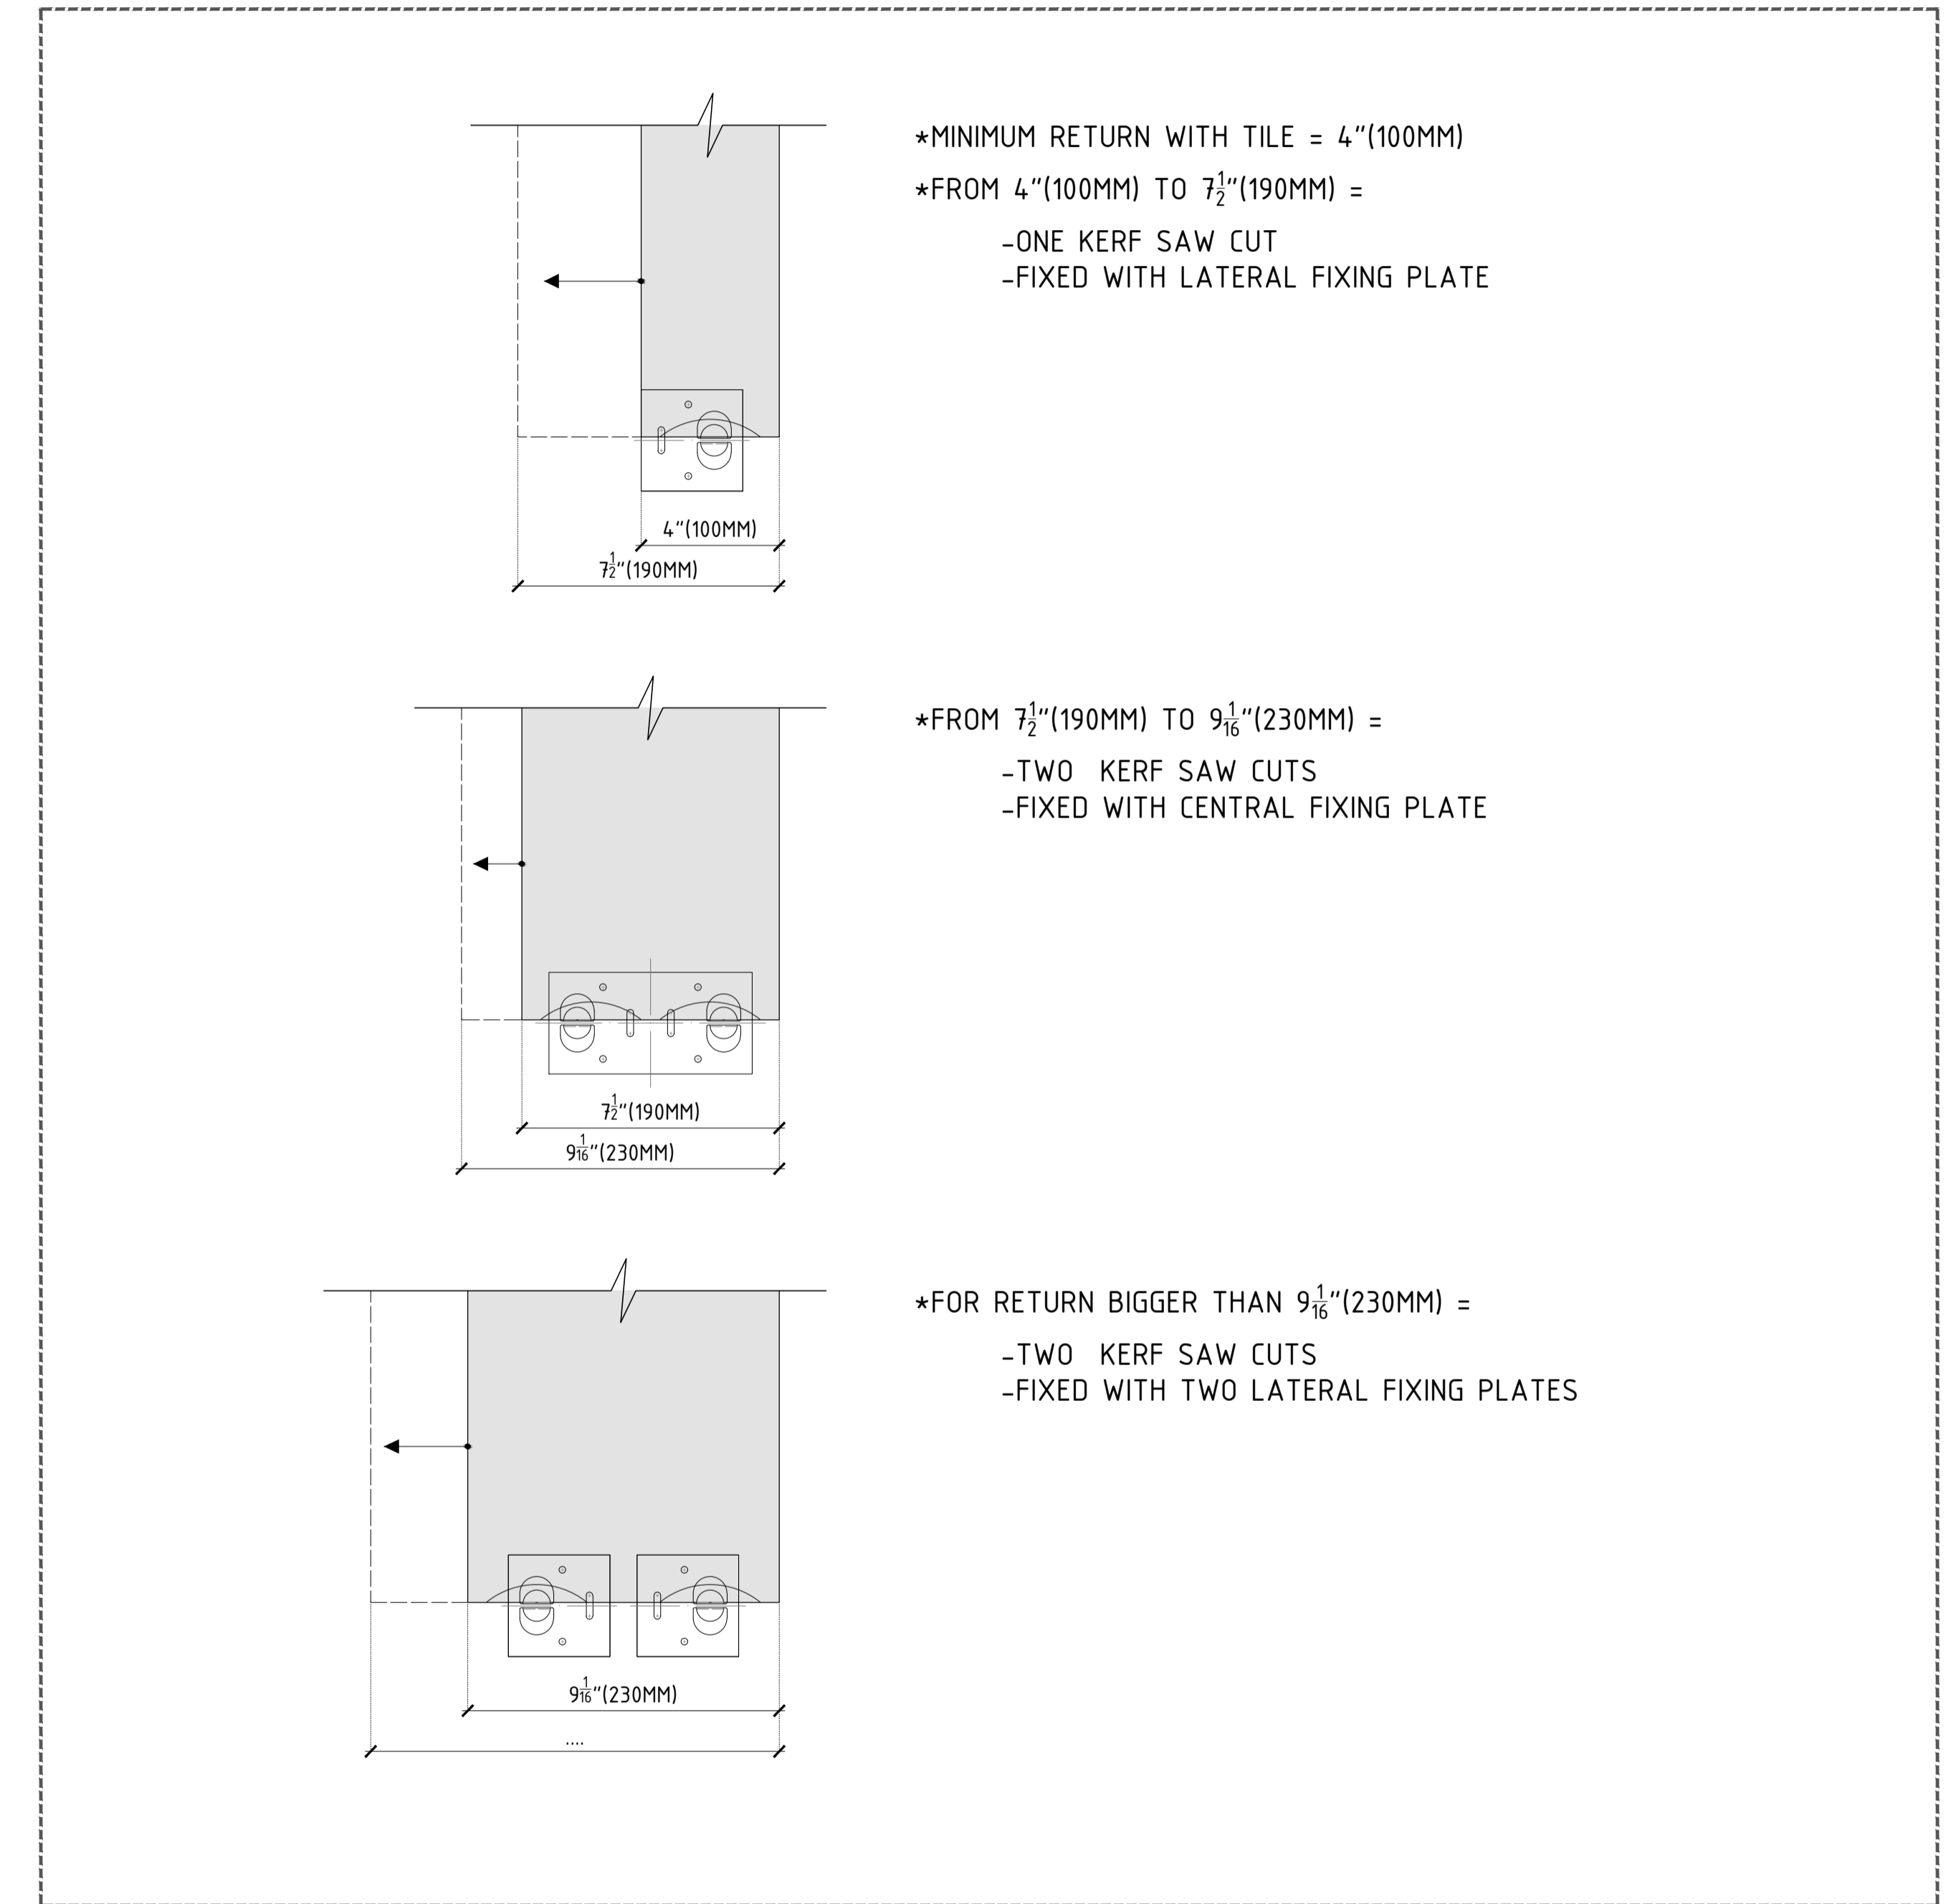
DETAIL A - TYPICAL WINDOW JAMB DETAIL WITH TILE RETURN
